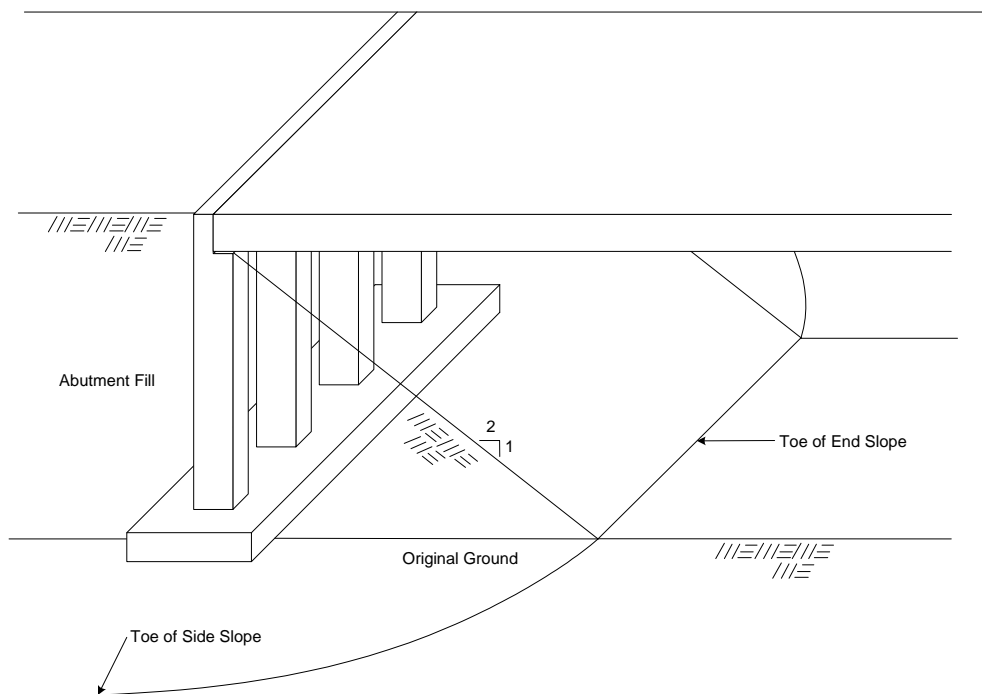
Spill-through abutment on combination strip footing (FHWA, 2002c).
